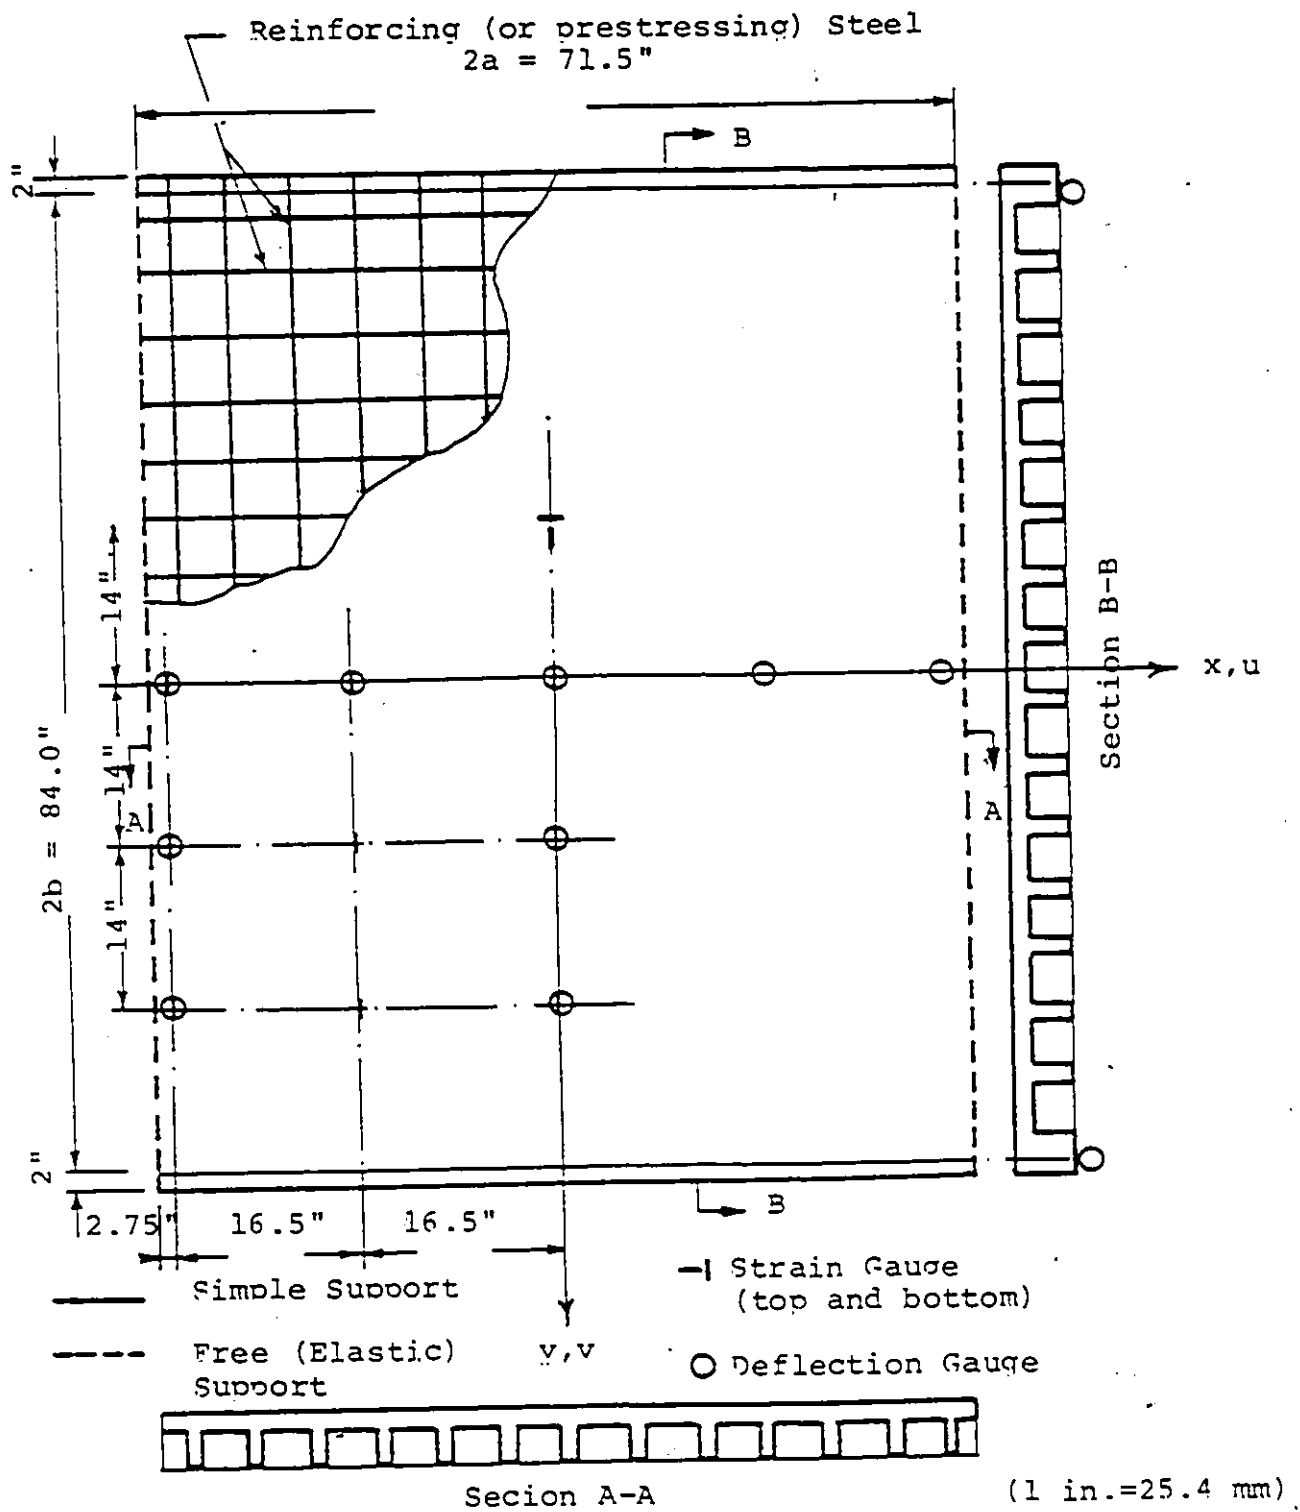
PLANFORM OF THE WAFFLE SLAB MODEL (RC1)
